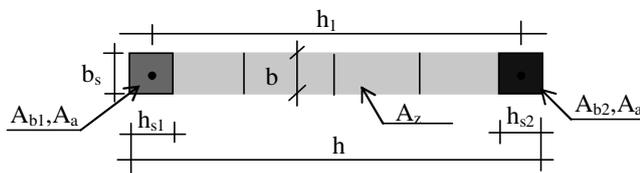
Structural masonry wall with concrete pillars (confined masonry)- horizontal section
